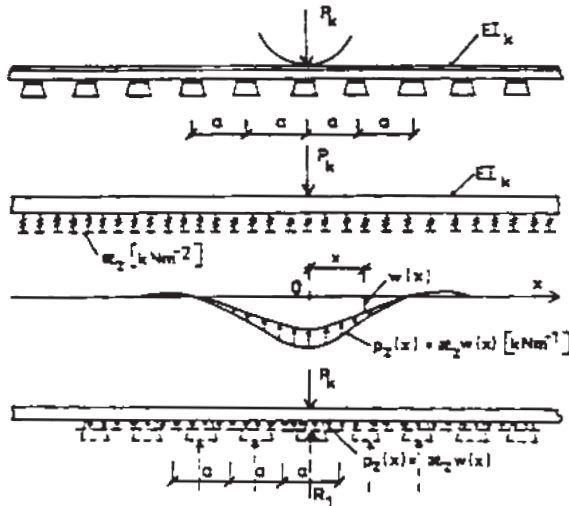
Standard Winkler beam on the linear elastic foundation modelling the track structure
